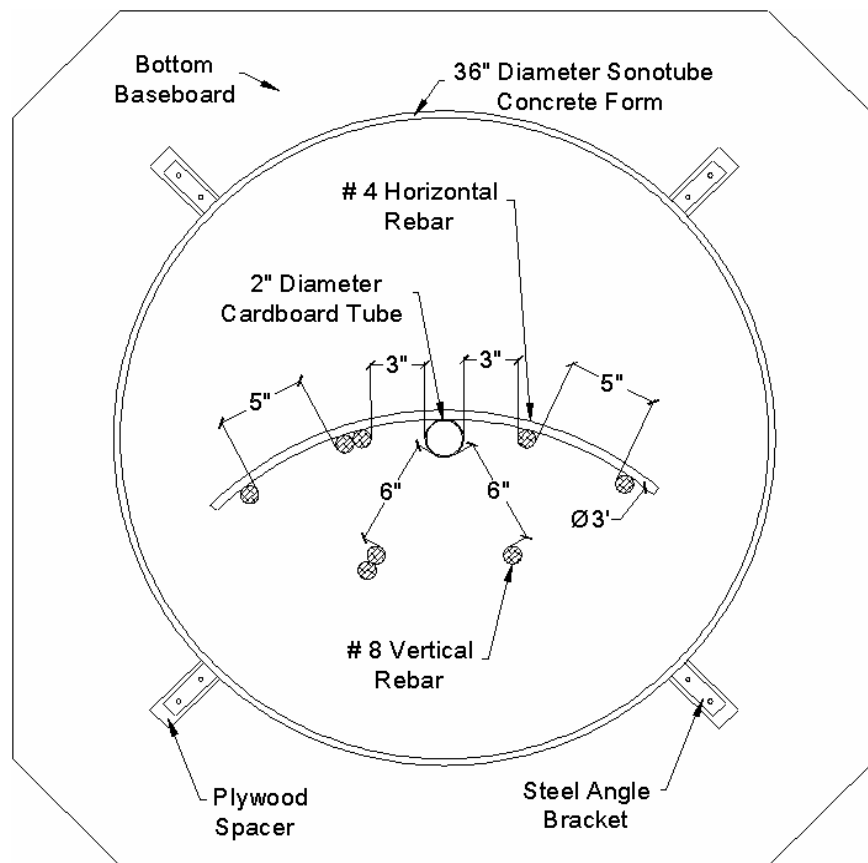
Plan View of a 2-inch Inner Diameter Ring Sample Designed to Simulate a Section of a 3-foot Diameter Drilled Shaft (including #8 Longitudinal Reinforcement and #4 Transverse Reinforcement)
